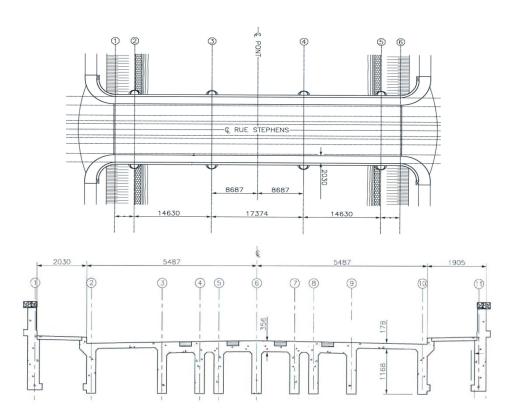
Plan View and Cross Section of the Monk Bridge, Montreal (Zaki 2000, with permission).
